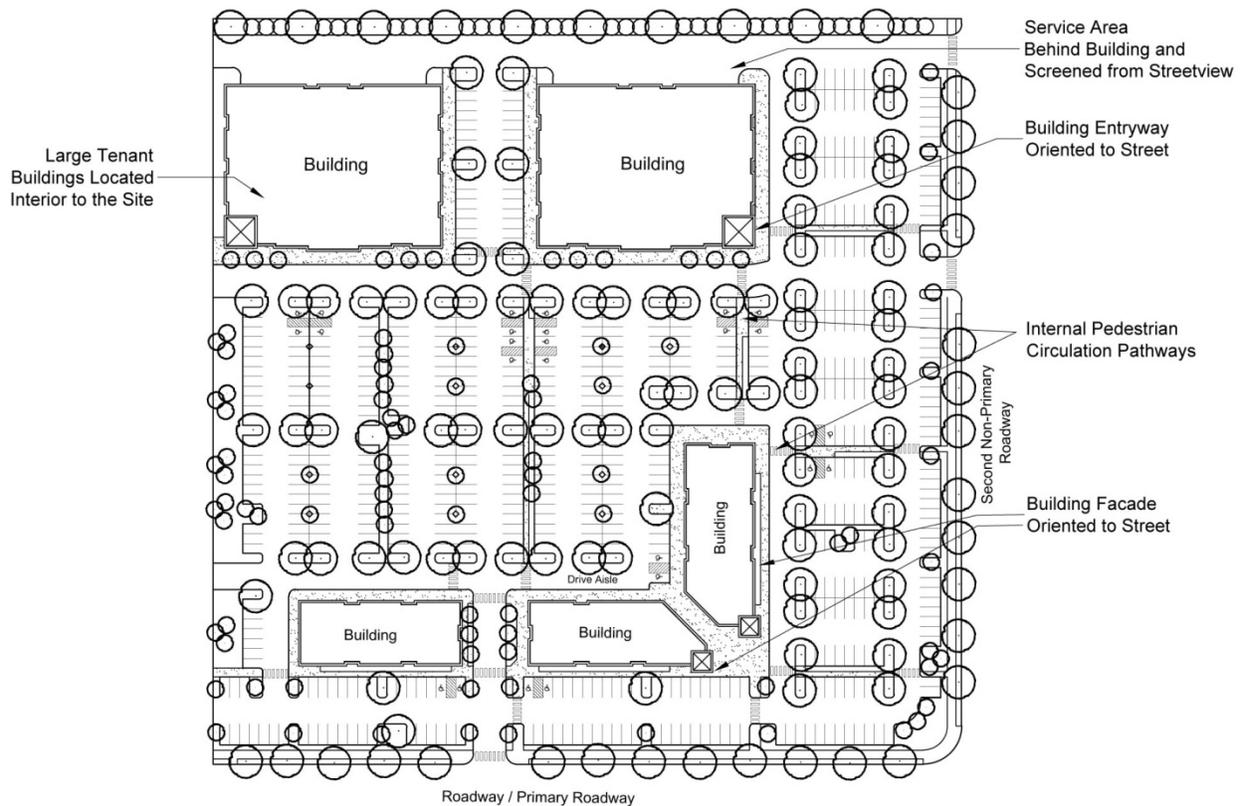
(b). – Site Layout - Building Orientation Standards
